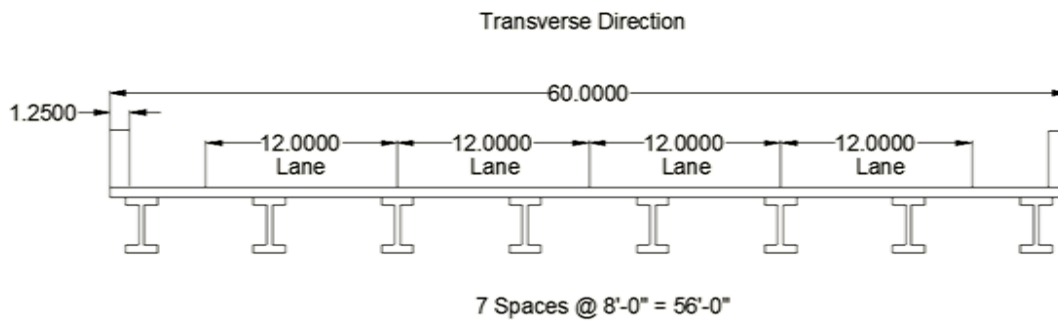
Transverse cross section of proposed Belmont Street/Route 9 Bridge re-design
